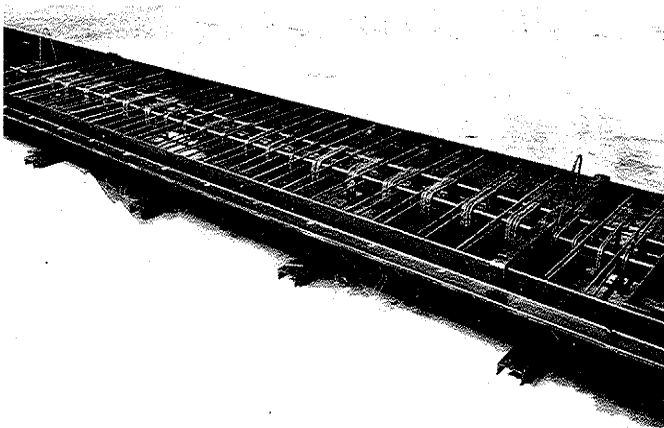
Beam reinforcement placed in steel mould, ready for casting.
